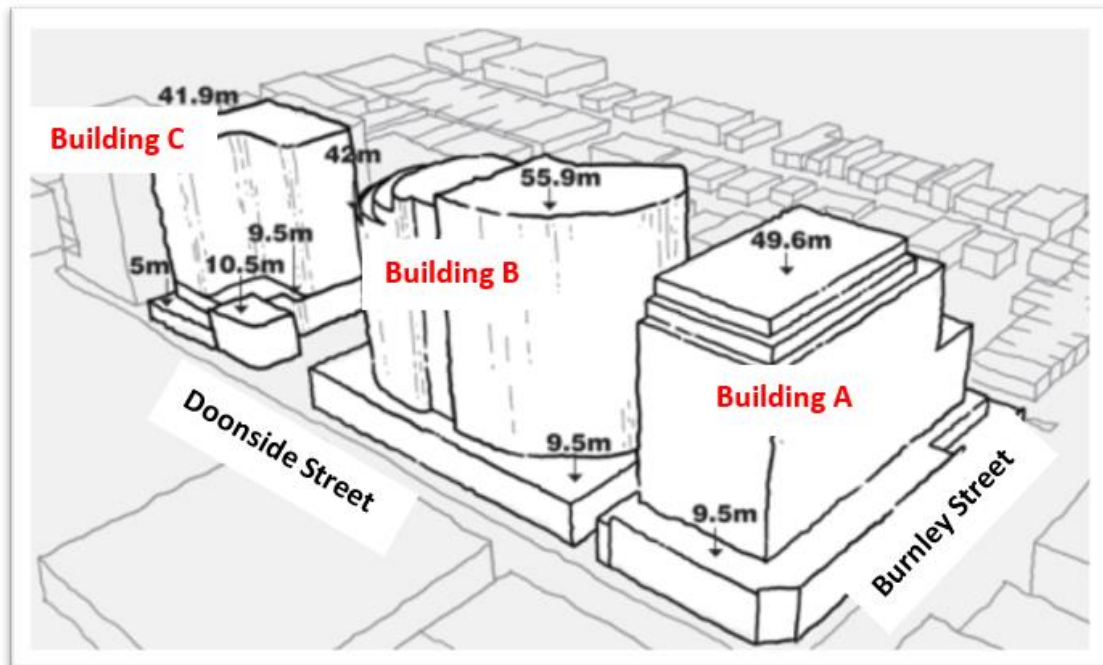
Proposed massing of buildings viewed from north-west. Source: Development Plan (Gurner 2023)
